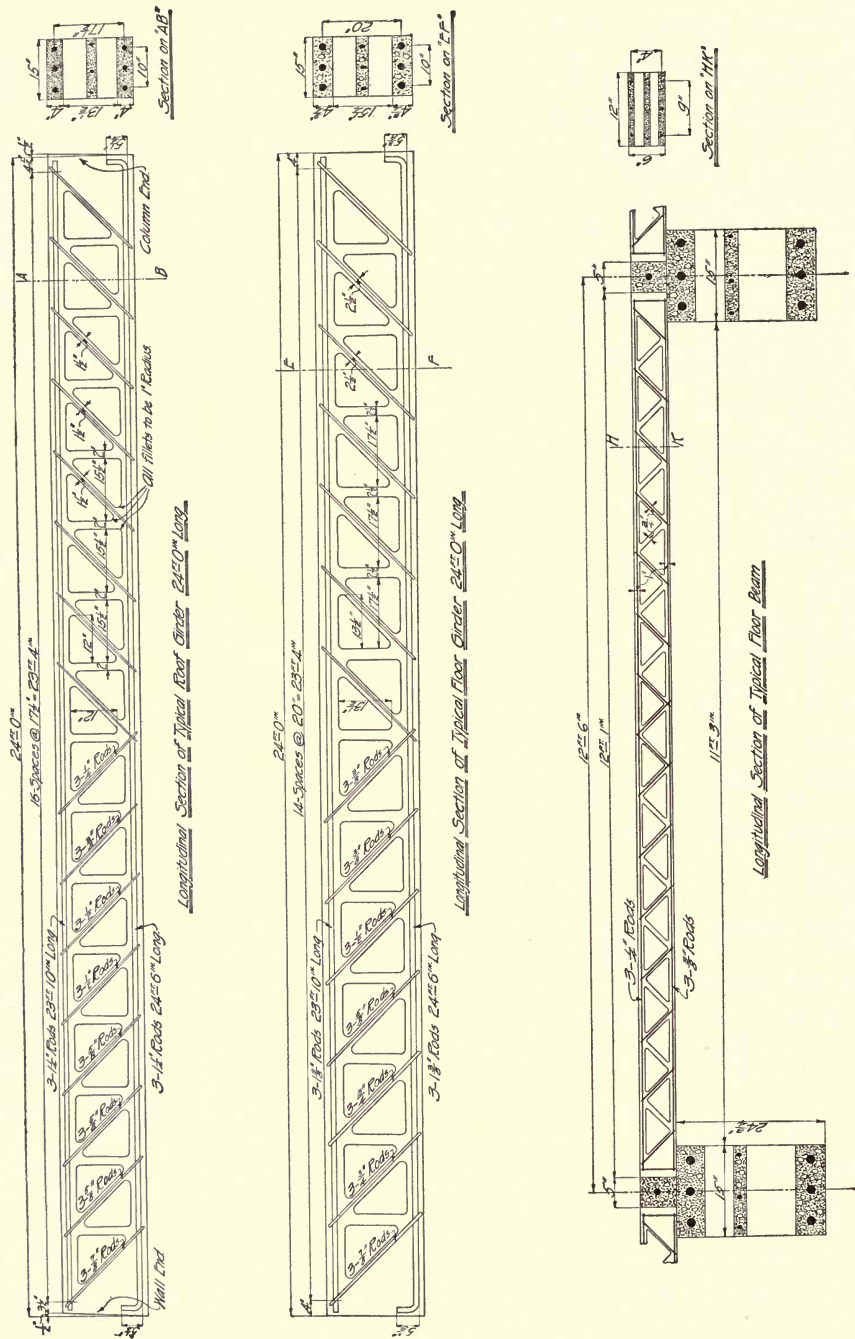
Details of Visintini Girders and Floor Beams. (See p. 151.)
